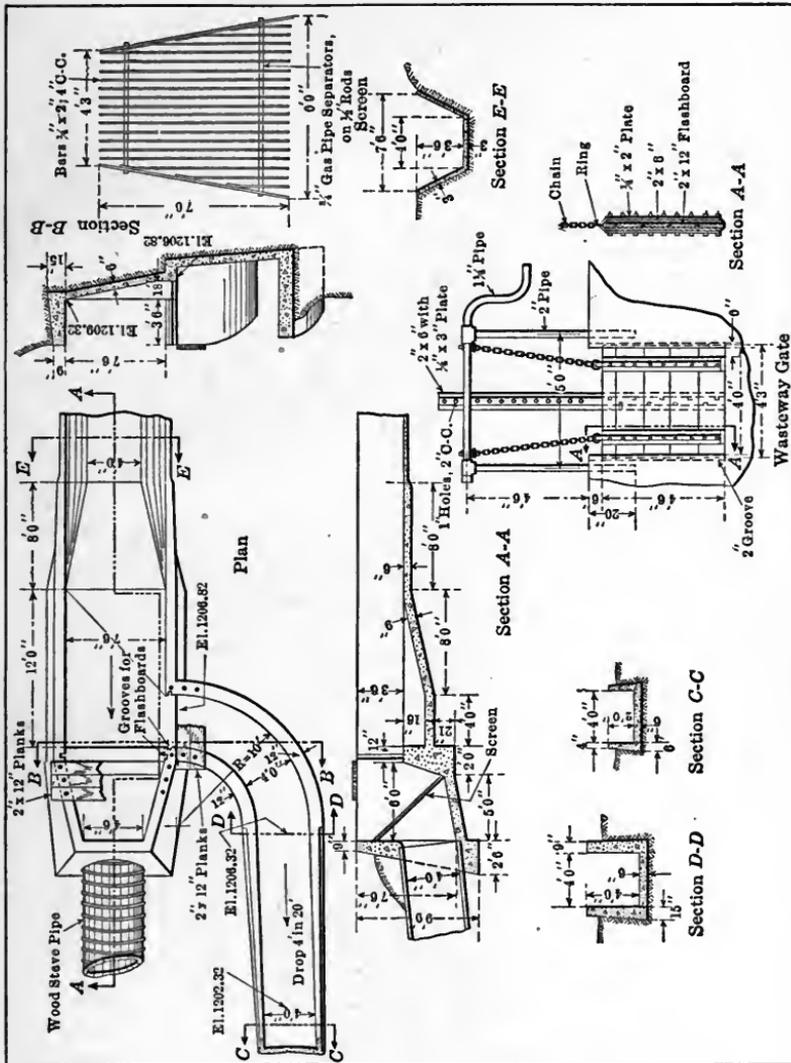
Inlet structure to 4-foot siphon. Kamloops Fruitlands Irrigation & Power Co., B. C.
